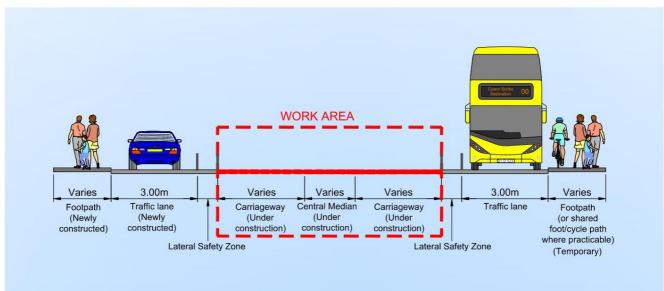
Traffic Management Cross Section, Section 3b – Stage 2
